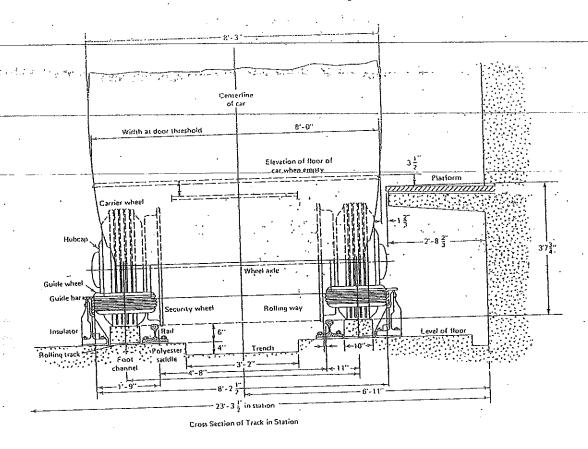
Cross section of track in station, for Montreal's rubber-tired transit system.
